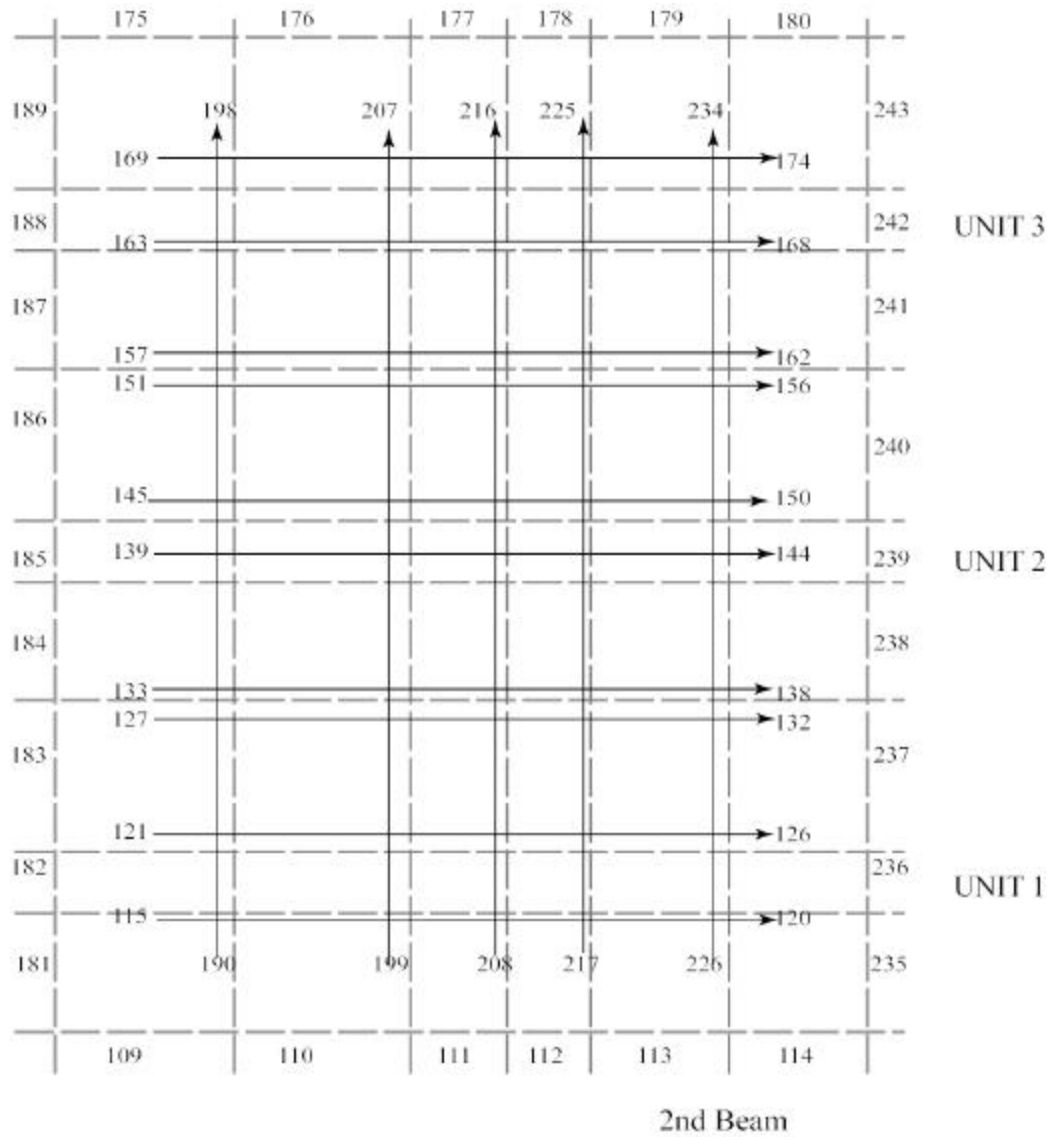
Locations, Orientation and Numbering of Frame Elements for the Second Floor of the Townhouse Index Building.
